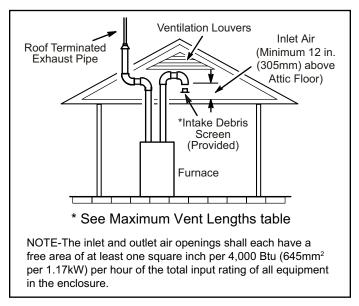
Equipment in Confined Space (Inlet Air from Ventilated Attic and Outlet Air to Outside)
